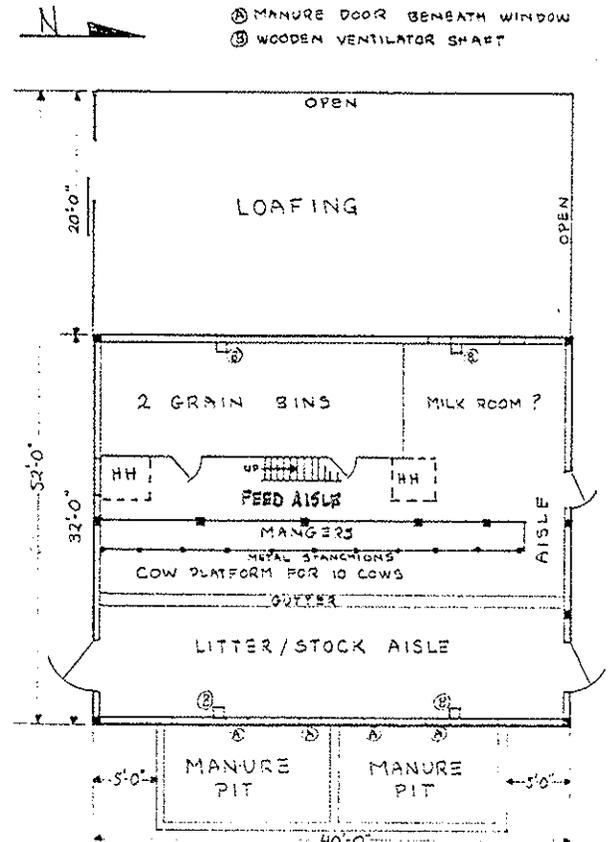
The G.P. Milde Barn, built in ca. 1929, also has a center feed aisle plan but is a dairy barn. (Plan not drawn to scale.)
